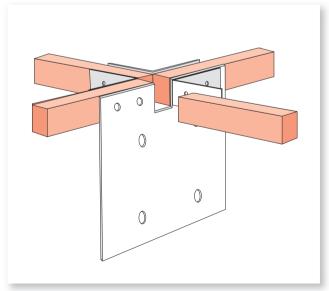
Details of the method of joining wooden struts with corner braces and mounting plate.
